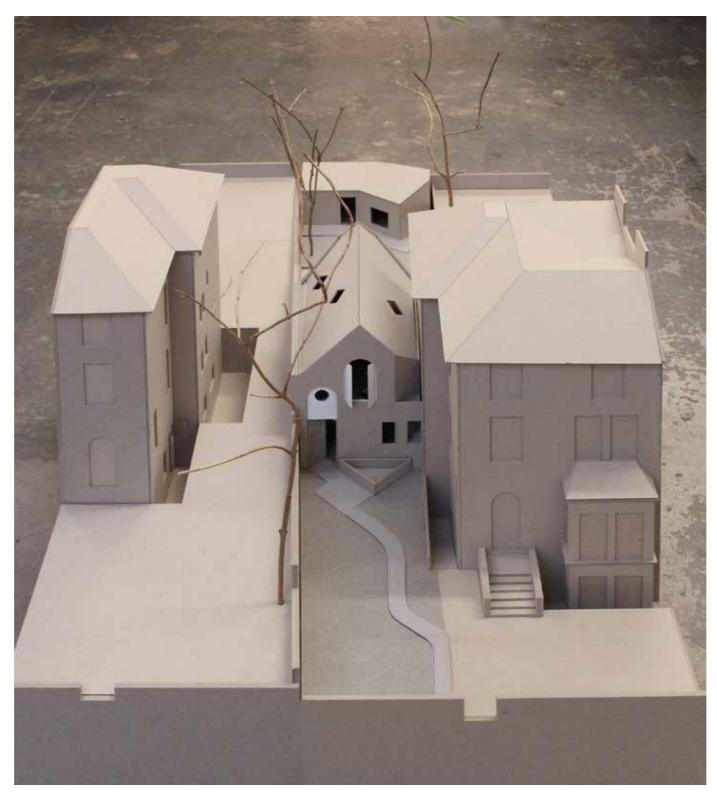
Card model illustrating an elevated view from the South along Lyndhurst Road.
